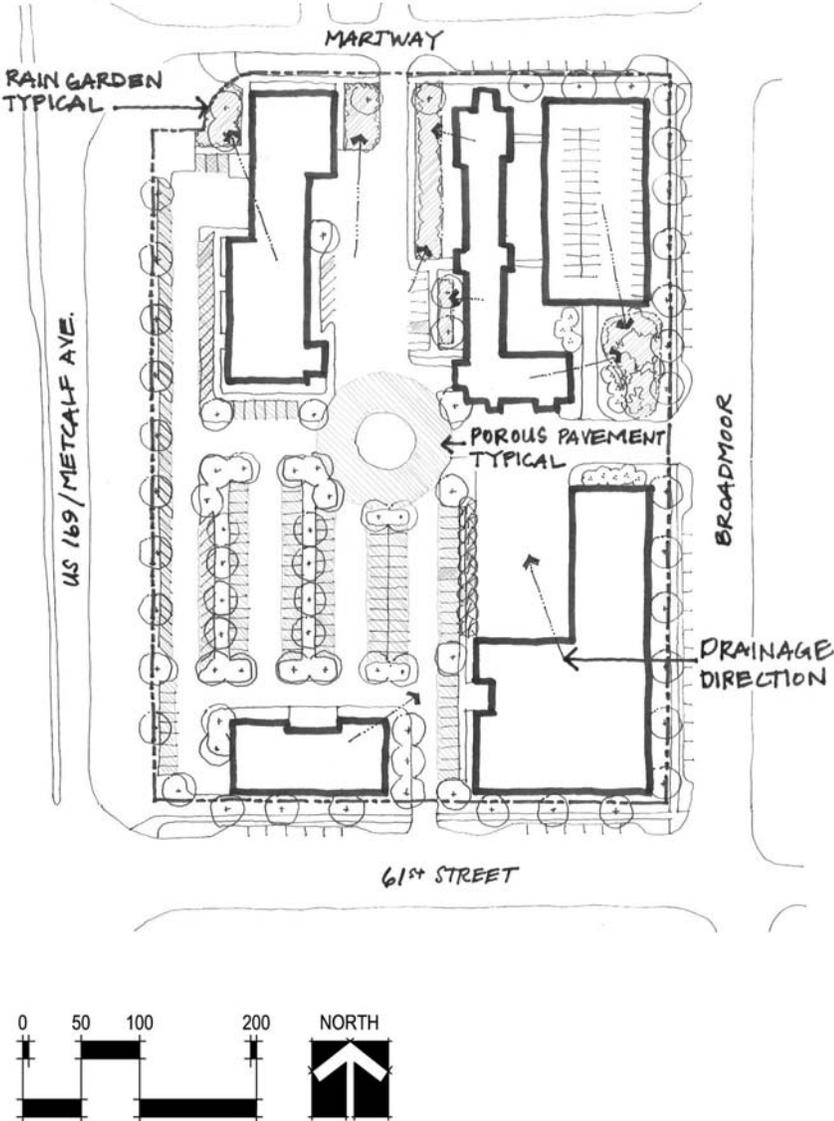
Metcalf Avenue Mixed-Use Development Site Layout
